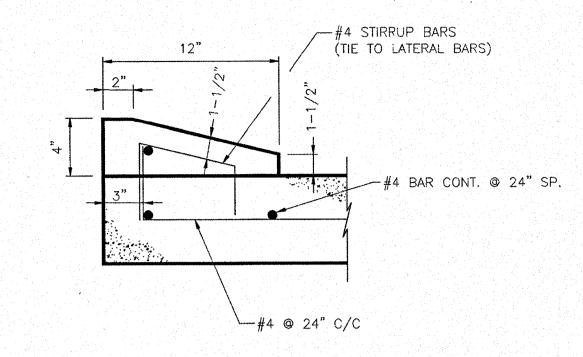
DETAIL - CONSTRUCTION JOINT SCALE: 1"=0.5"
